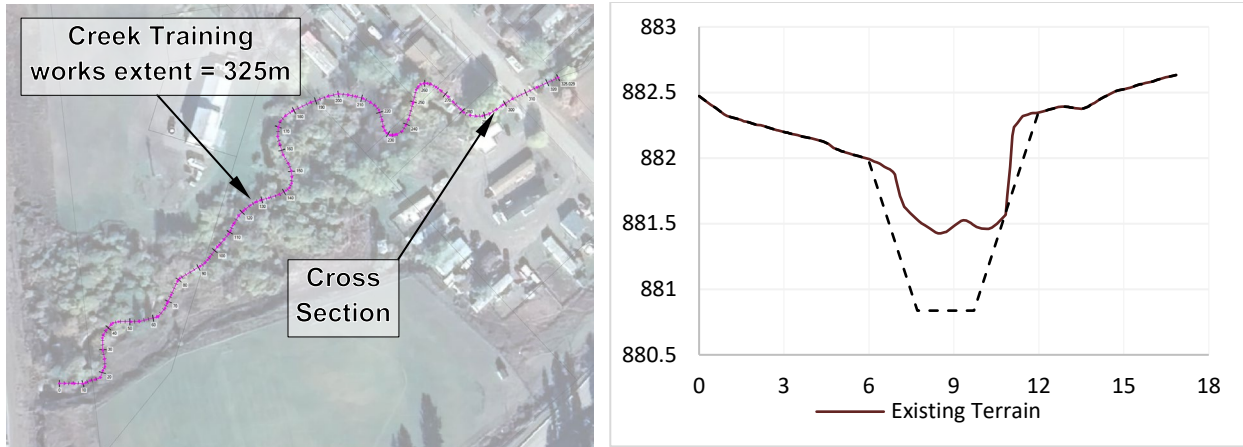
PLAN VIEW (LEFT) AND CROSS SECTION (RIGHT) OF THE PROPOSED WORKS
